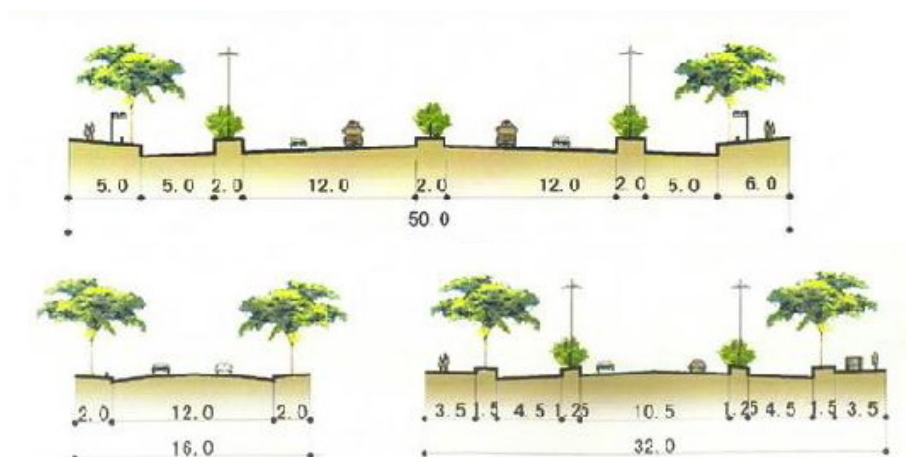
Roads’ Cross-sections including Sidewalk and Bicycle Lane
